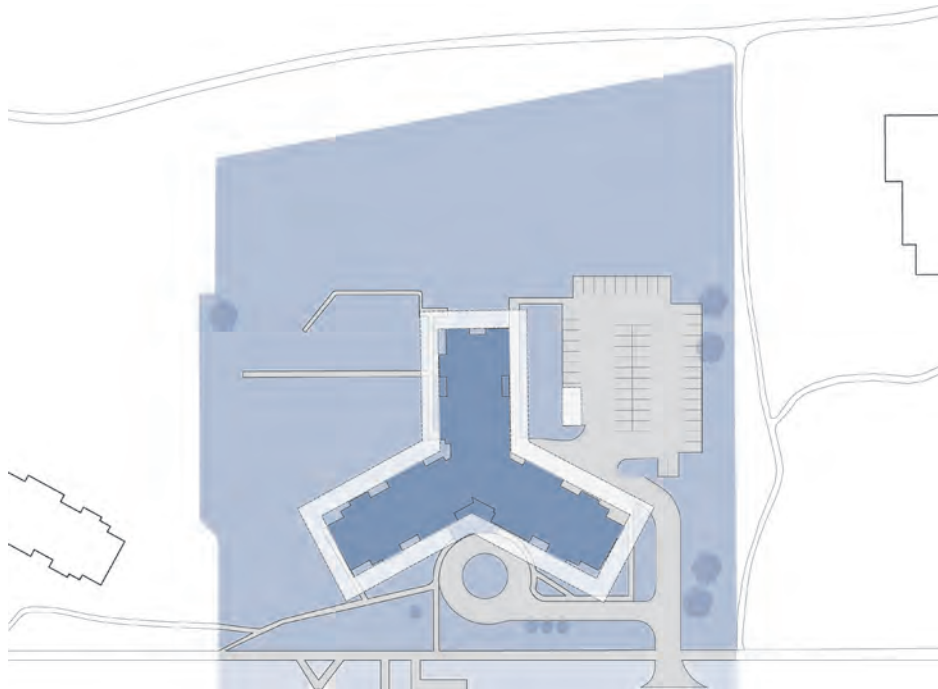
Tower C staging indicates very minimal impact on parking, vehicular and pedestrian access.
